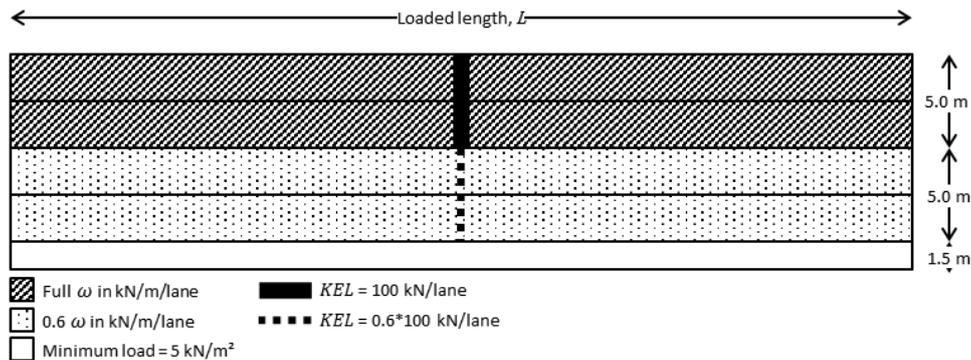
Load distribution plan on a bridge with 11.5 m carriageway (Study '87) [4]
